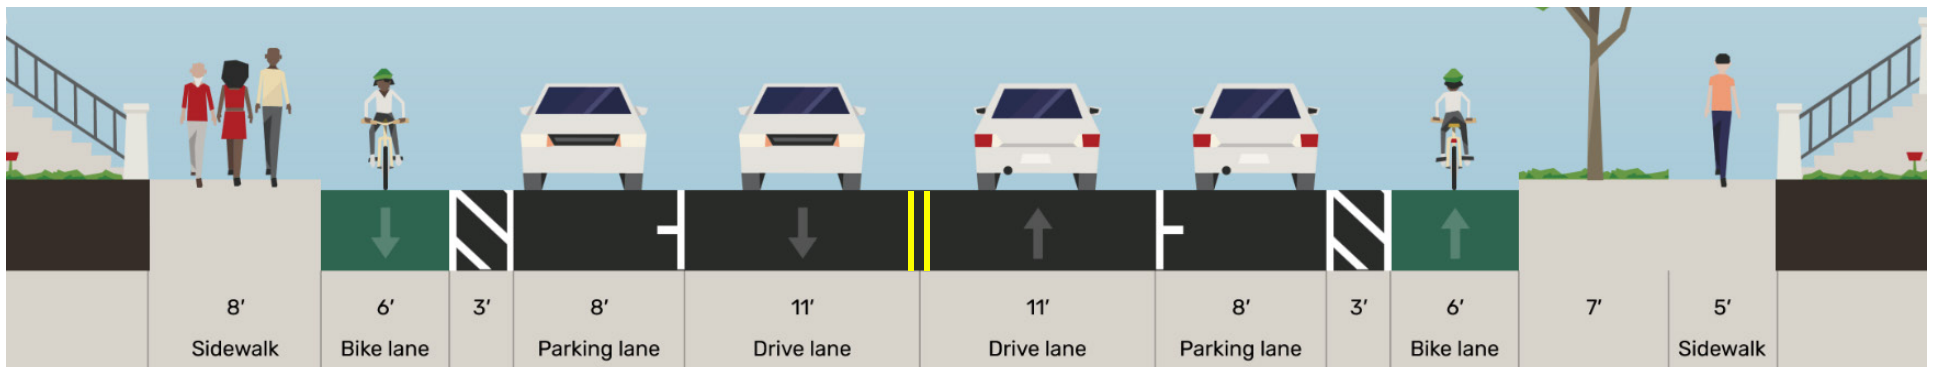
Proposed cross-section: W 120th St from west City limits to Inglewood Ave
